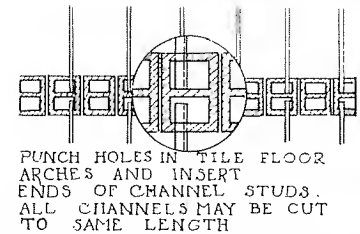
Top and bottom ends of studs secured to structural tile floor without use of runners.
